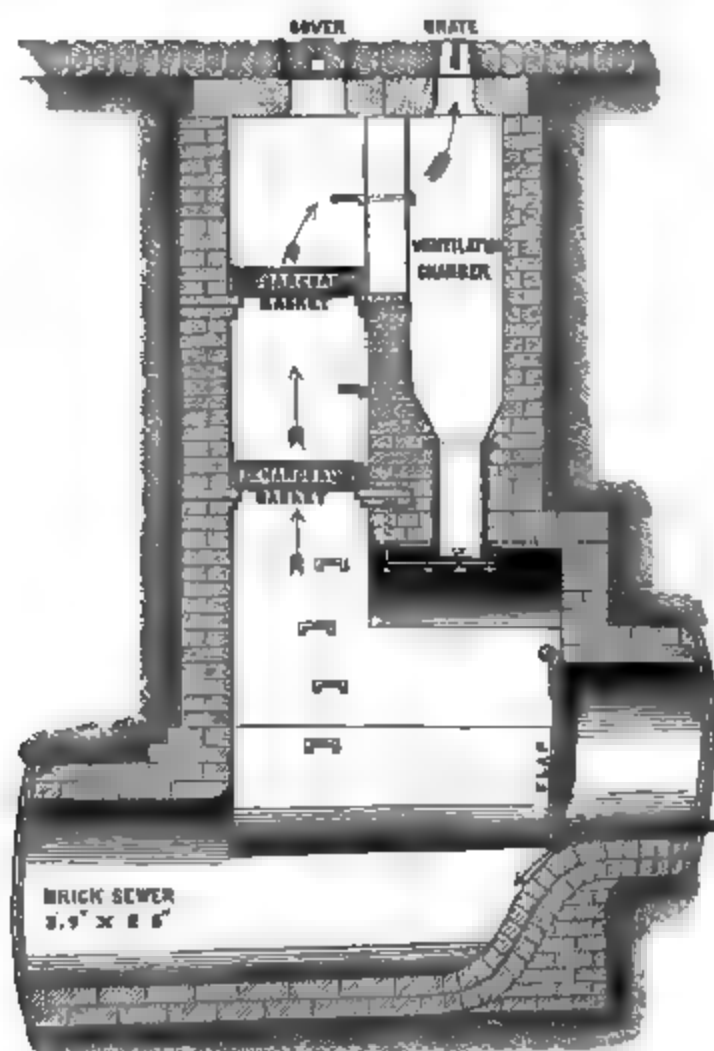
Manhole, Lambing Bay, and Double Ventilating Arrangement.
